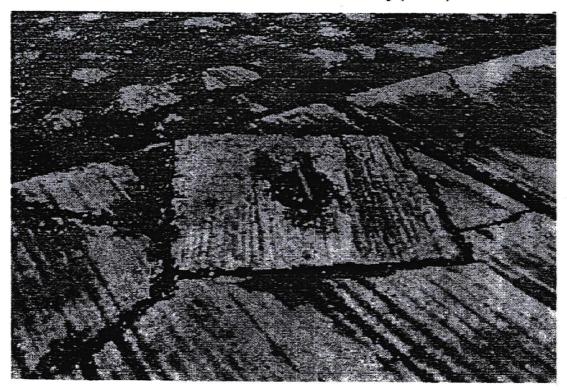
View of a RAF Riccall Anchor Point (Site 61)
